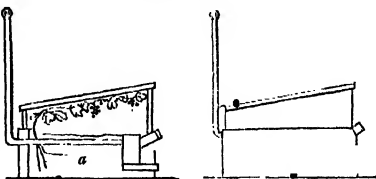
Section and End Elevation of Mr. White's Vine Pit.
